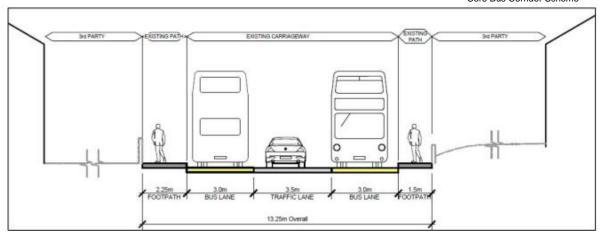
SY1C Cross-Section A-A Swords Road South of Omni Shopping Centre
